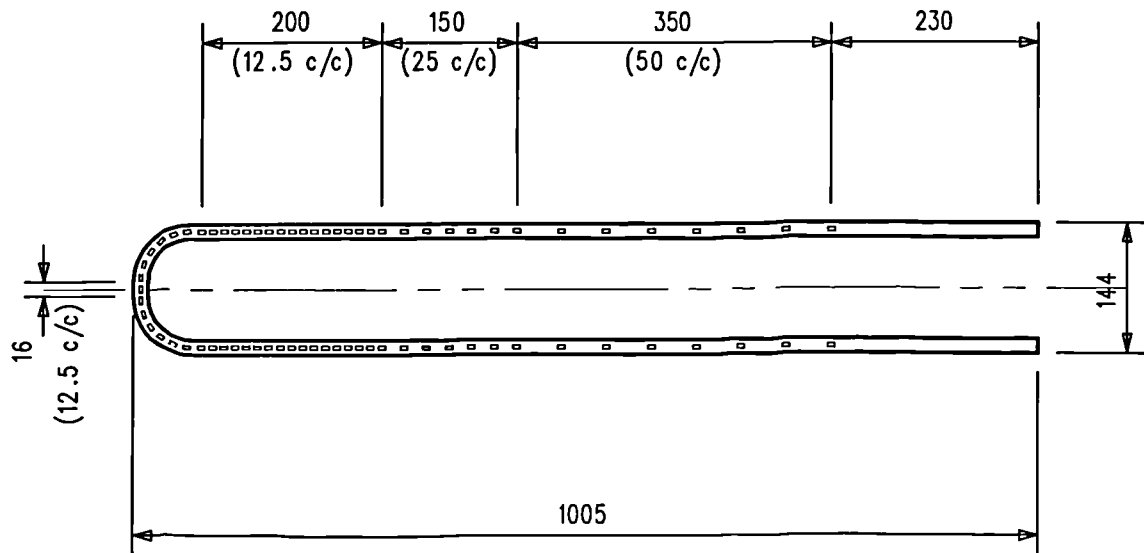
Column rebar - strain gauge layout C
